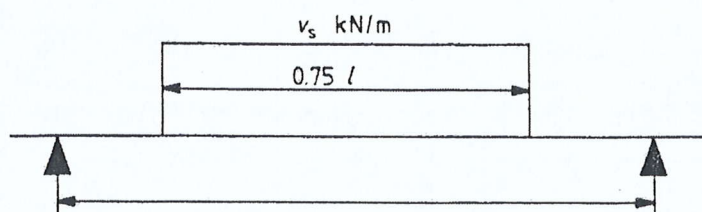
Distribution of load on a beam supporting a two-way spanning slab
